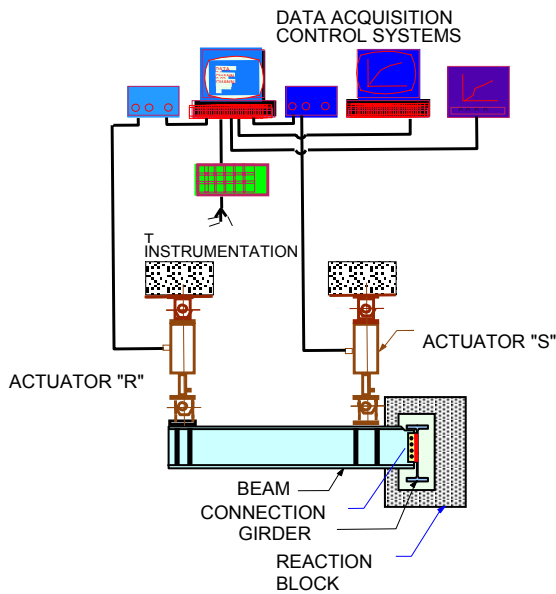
Test Set-up and Typical Specimen of Beam-to-Girder Shear Tab Connection (Shaw and Astaneh-Asl, 1992)
